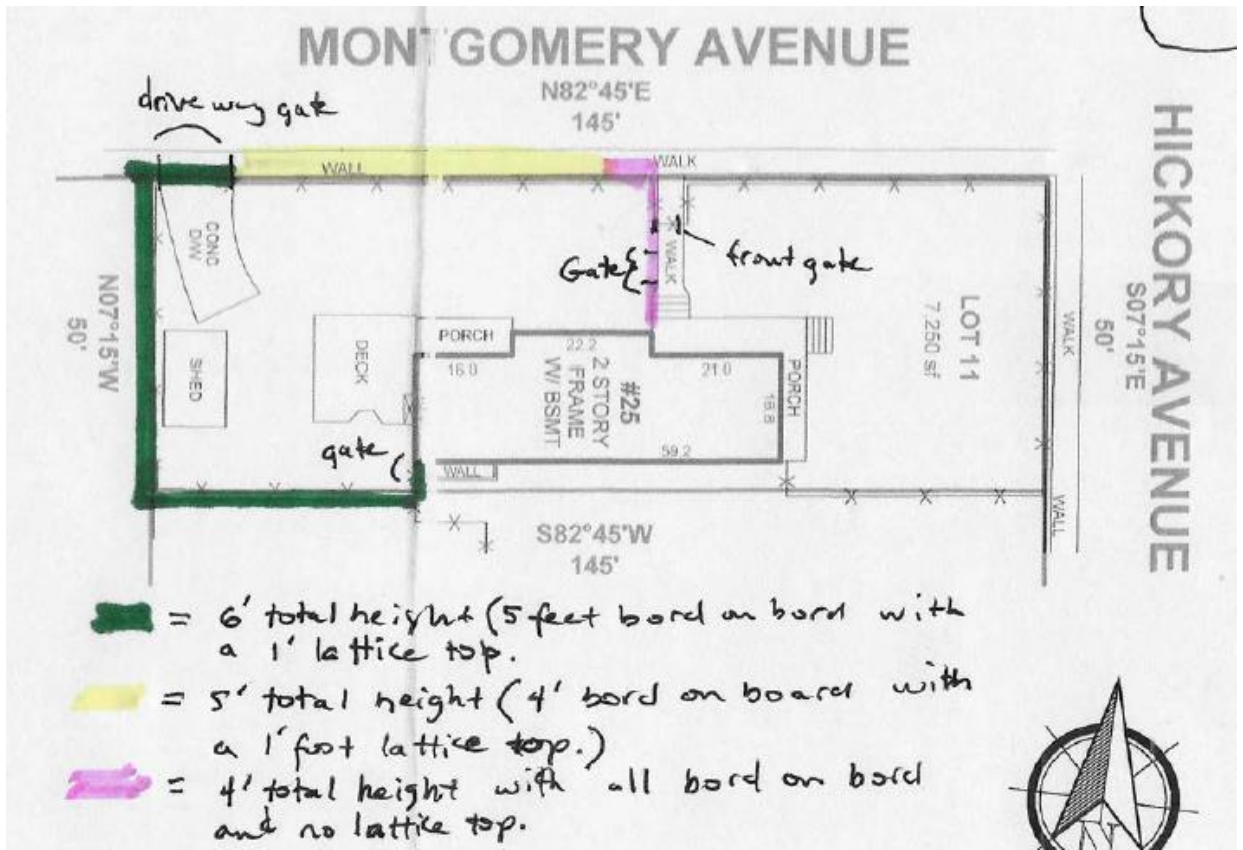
Proposed site plan showing the height and location of the proposed fencing.
